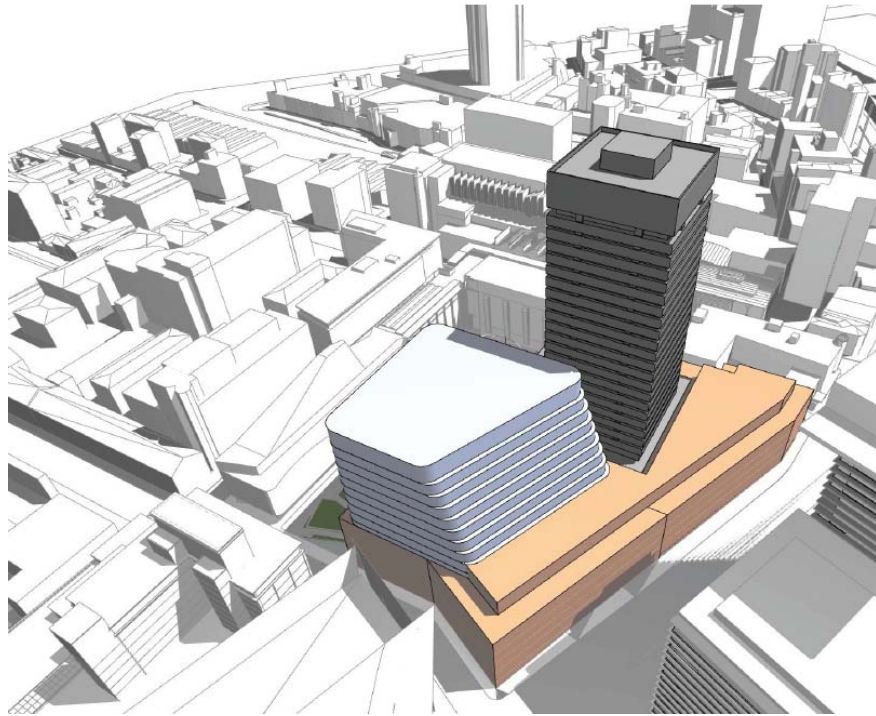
Proposed expanded Building 2 envelope (in blue)
